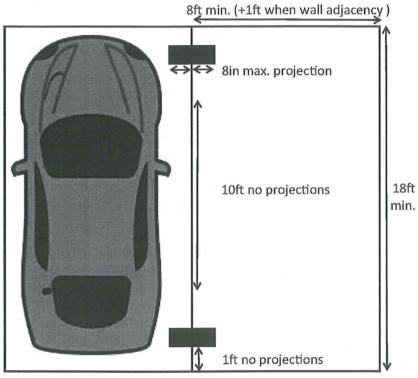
City of North Vancouver Requirements for Parking Stall Dimension and Setbacks from Structures.
